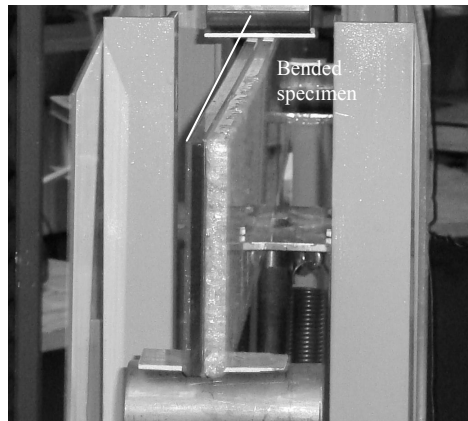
The thermally tempered specimens are slightly bended when one layer breaks due to extension of that layer.
